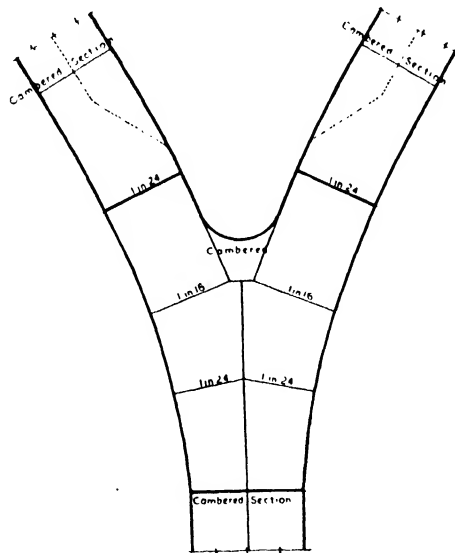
SUPERELEVATION AT ROAD JUNCTION.
